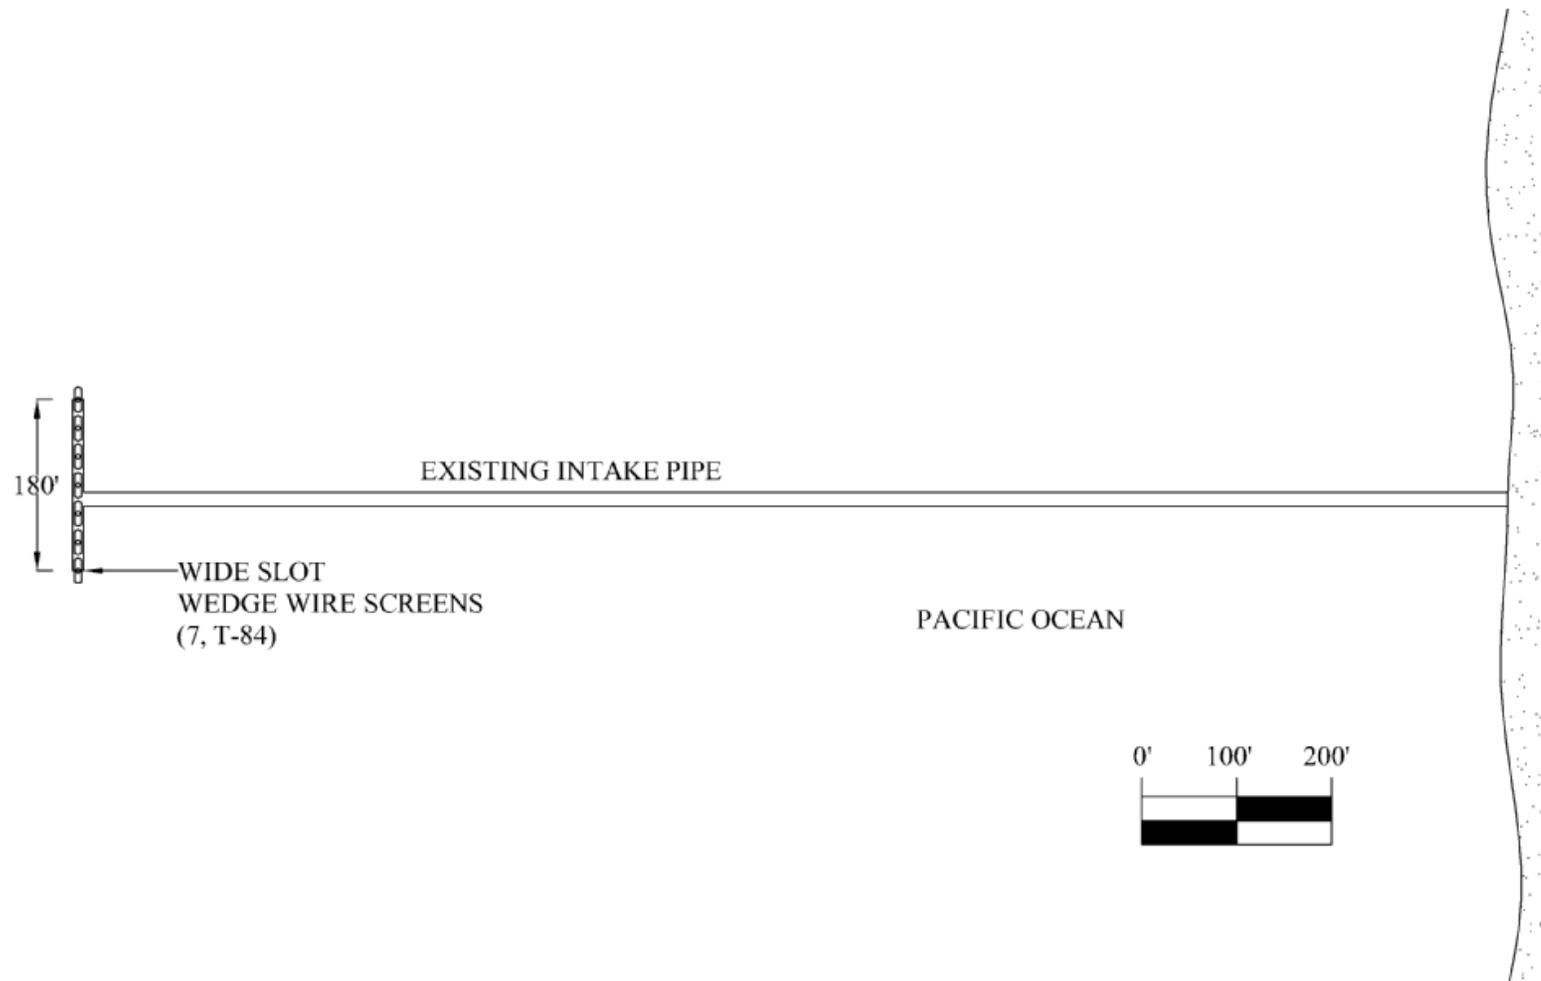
Cylindrical Wedgewire Screen, 9.5 mm Slot Width — Plan
